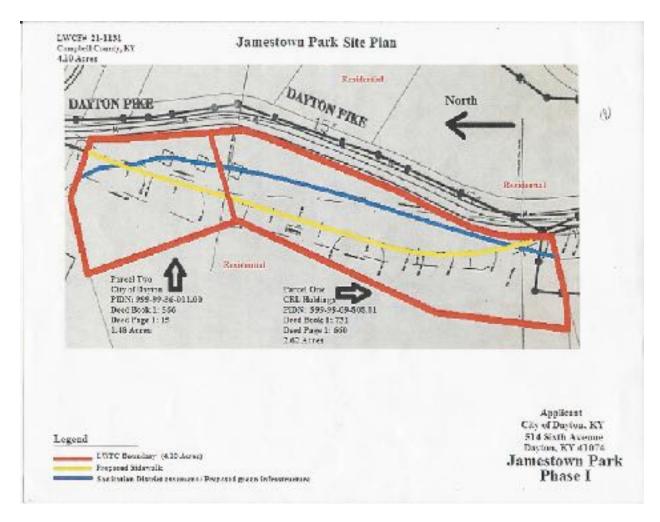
Site Plan Showing the Proposed Jamestown Park Boundary, Proposed Sidewalk, and existing Sanitation District easement.
